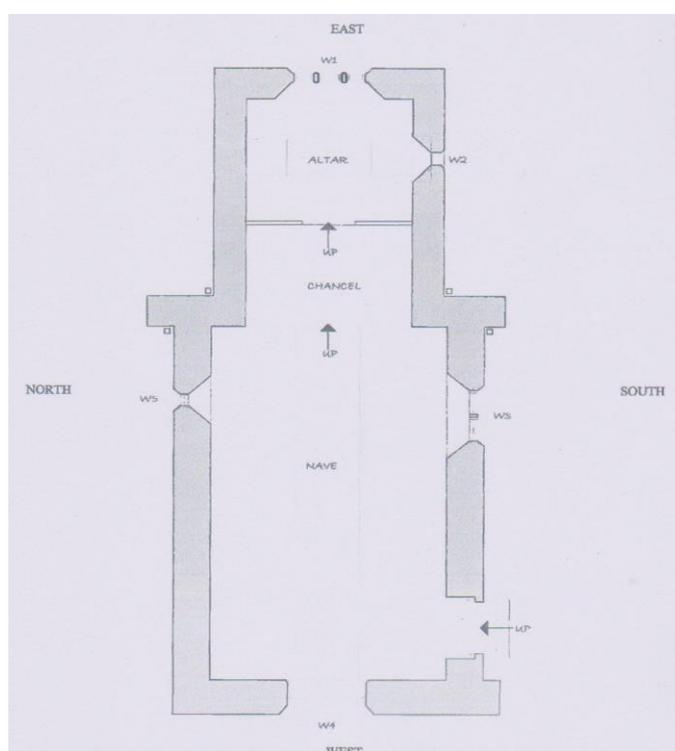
Architect's Sketch Plan of St. Eldeyrn's Church
